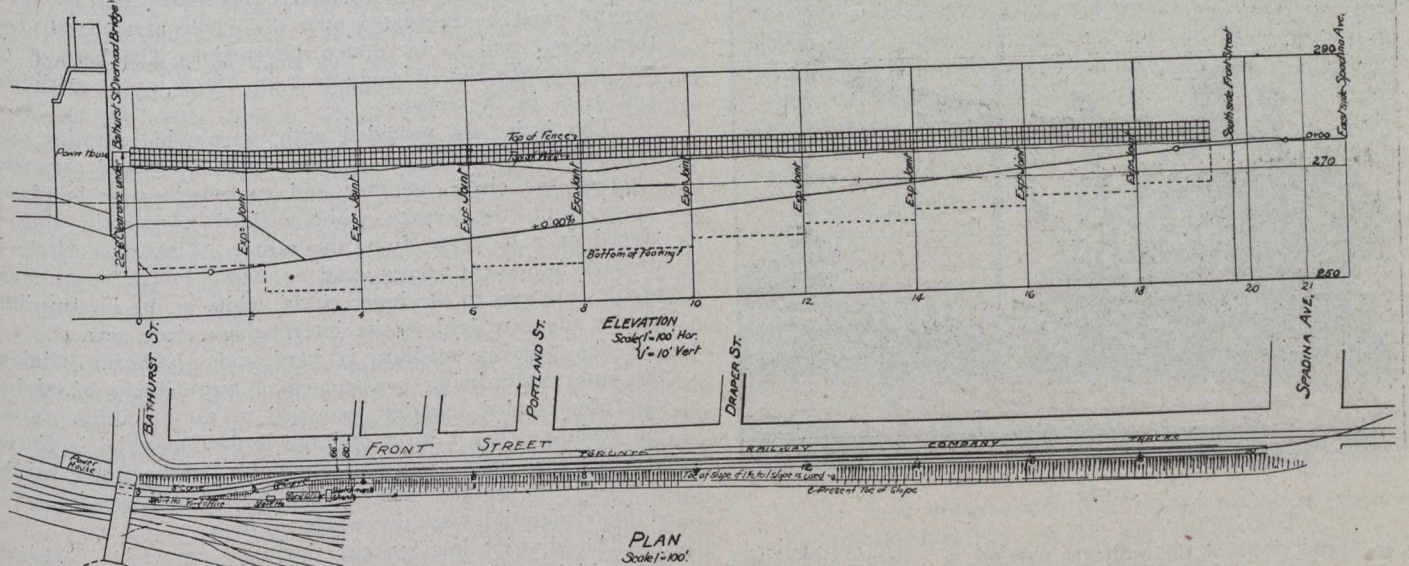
Location of New Retaining Wall for C.P.R. Along Front Street, Toronto.
